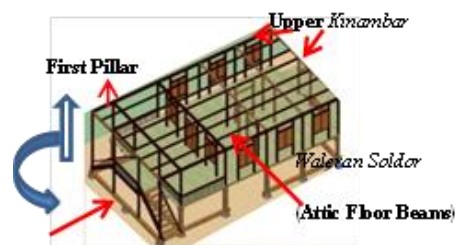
Structure and Construction of beams-pillars and determining the First Pillar
